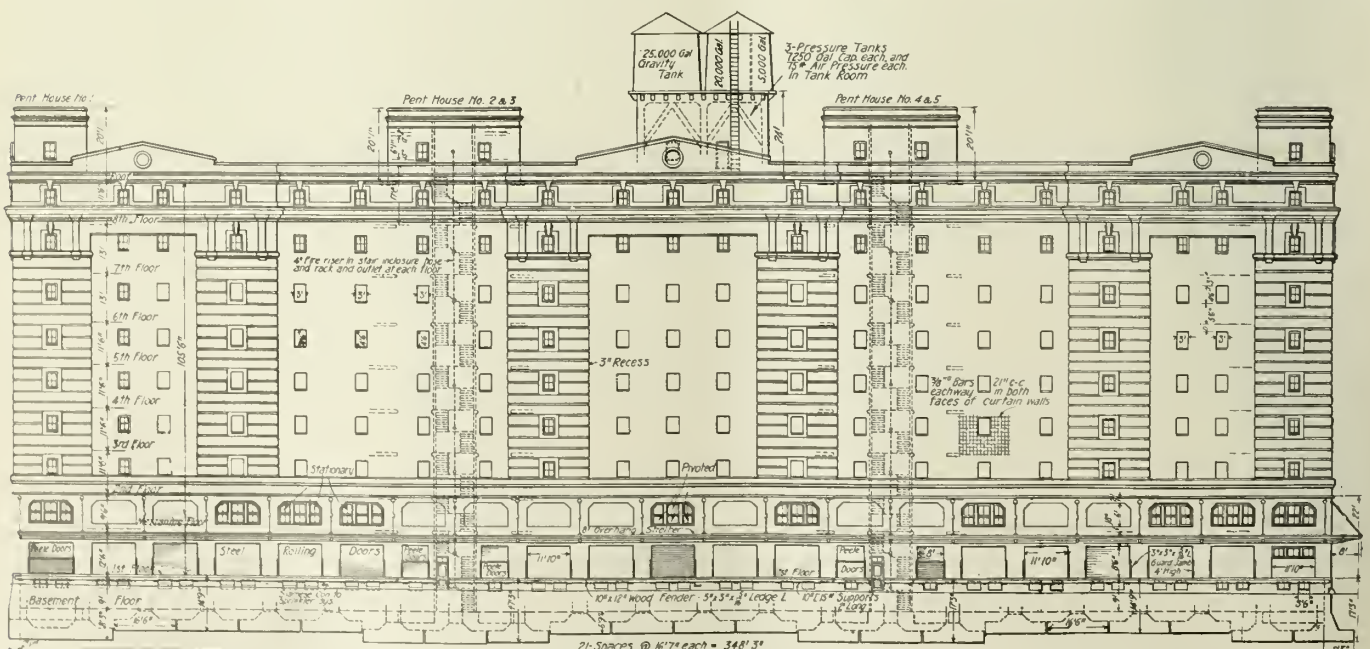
Side Elevation of 8-Story Concrete Terminal Warehouse of B. & O. R. R., in New York.
